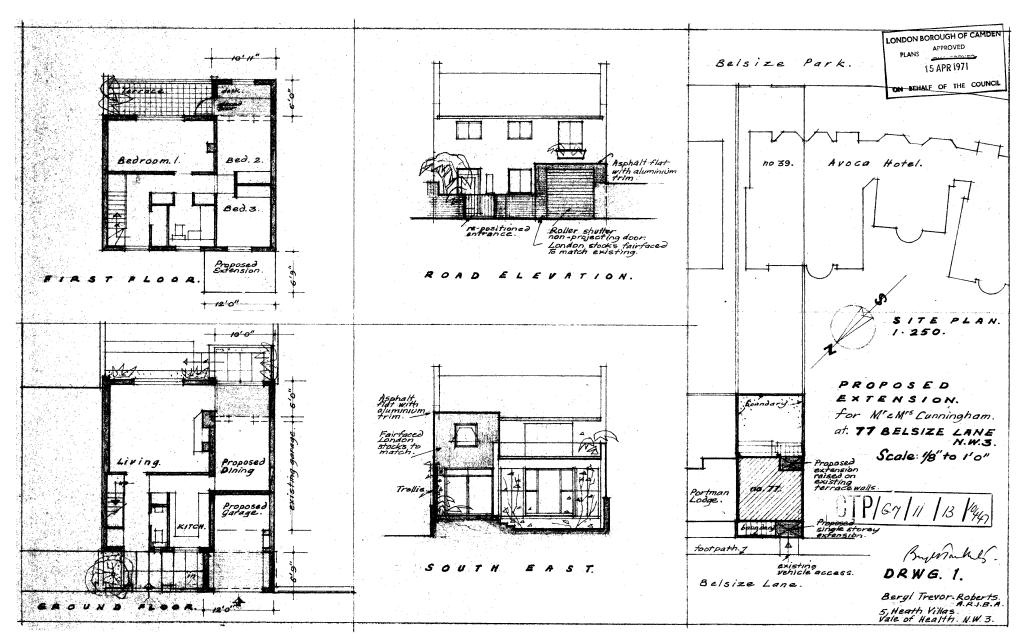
No. 77 Belsize Lane existing & proposed drawings.
